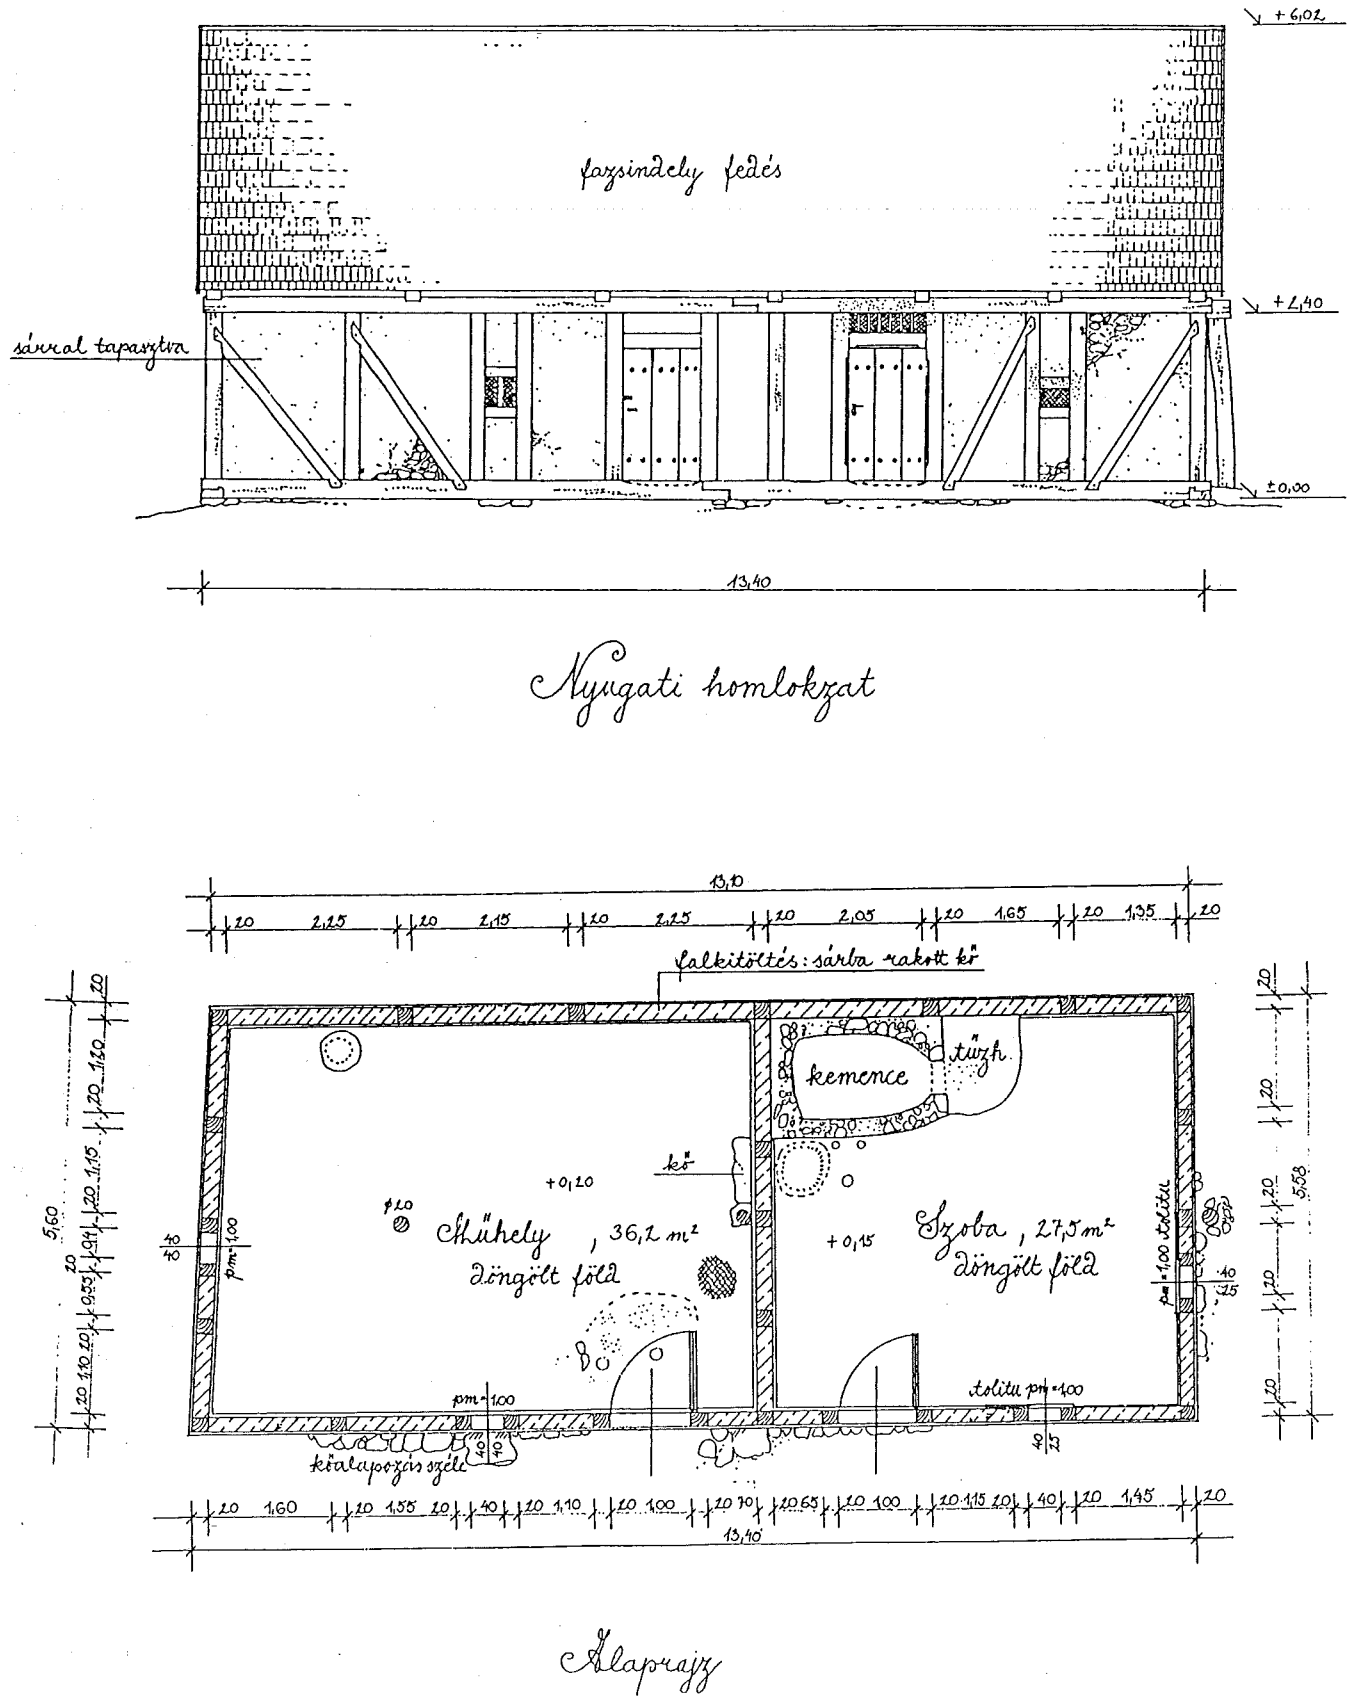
Visegrád, suburbium settlement, reconstruction of house 1 (beginning of the 14th century): W façade and ground-plan (drawn by T. Sabján).
